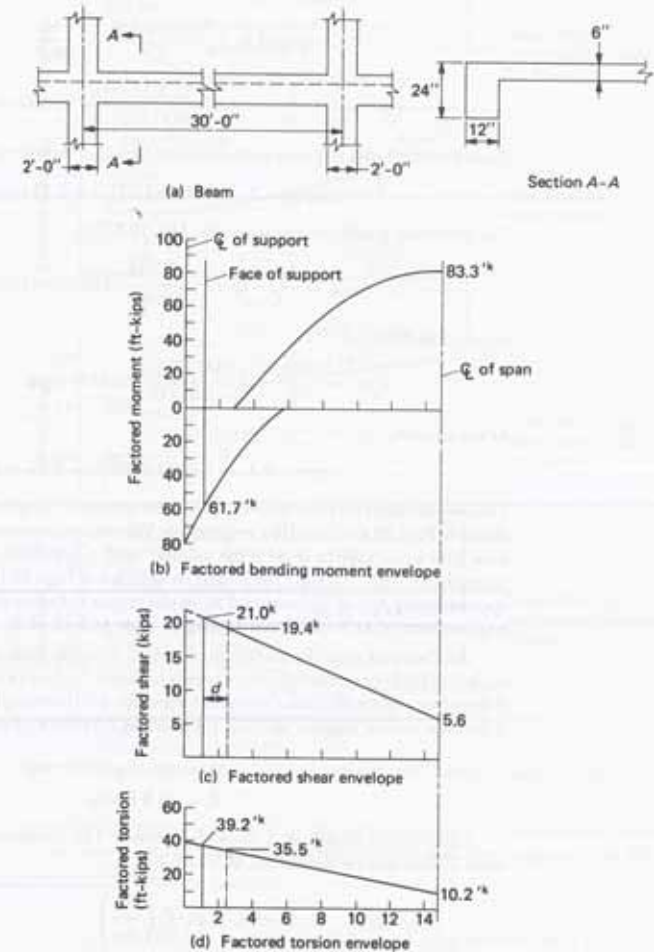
Spandrel beam including design loadings, for Example 19.14.2. (Adapted from Mattock [19.75].)
